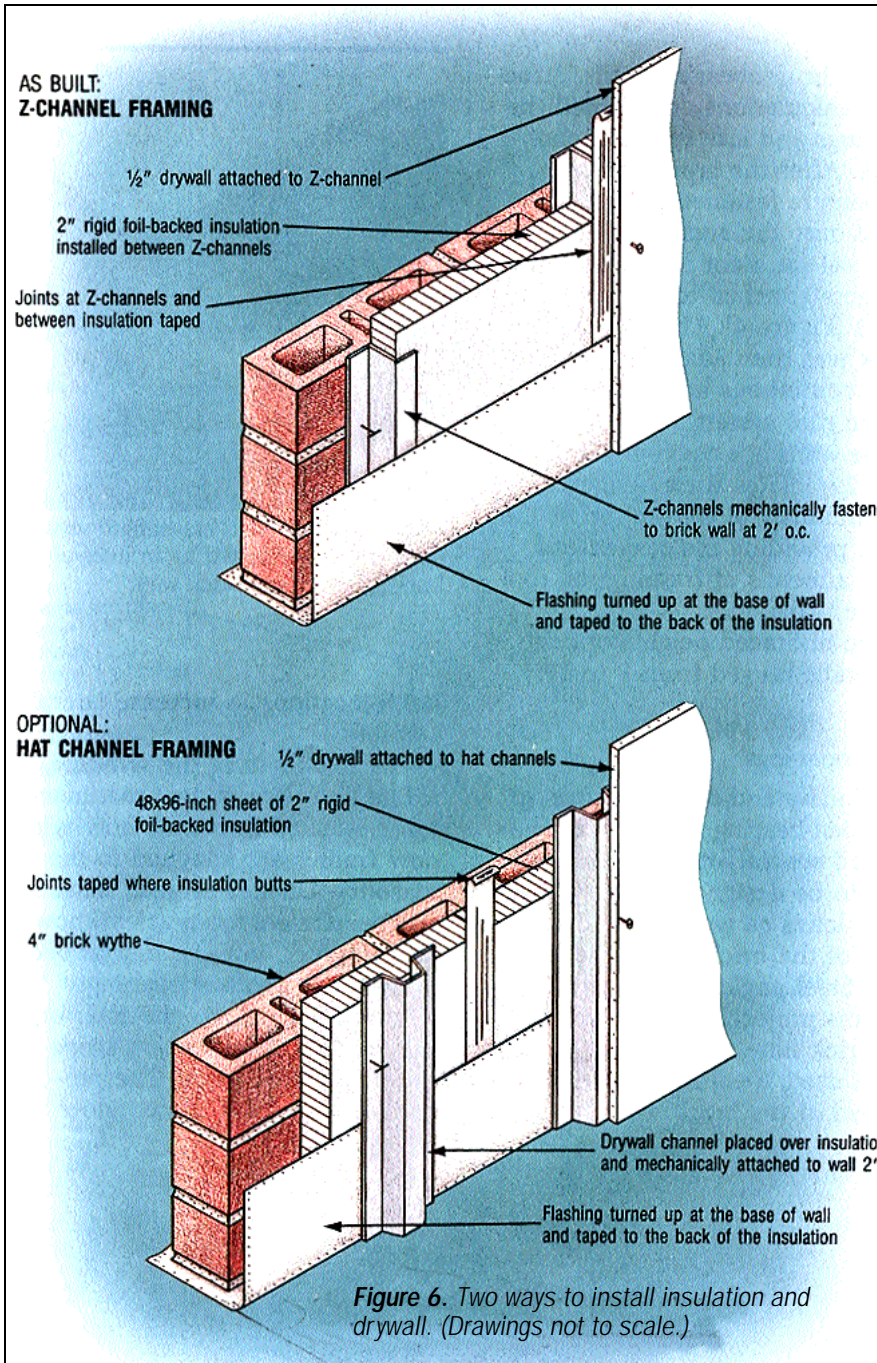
Two ways to install insulation and drywall. (Drawings not to scale.)
